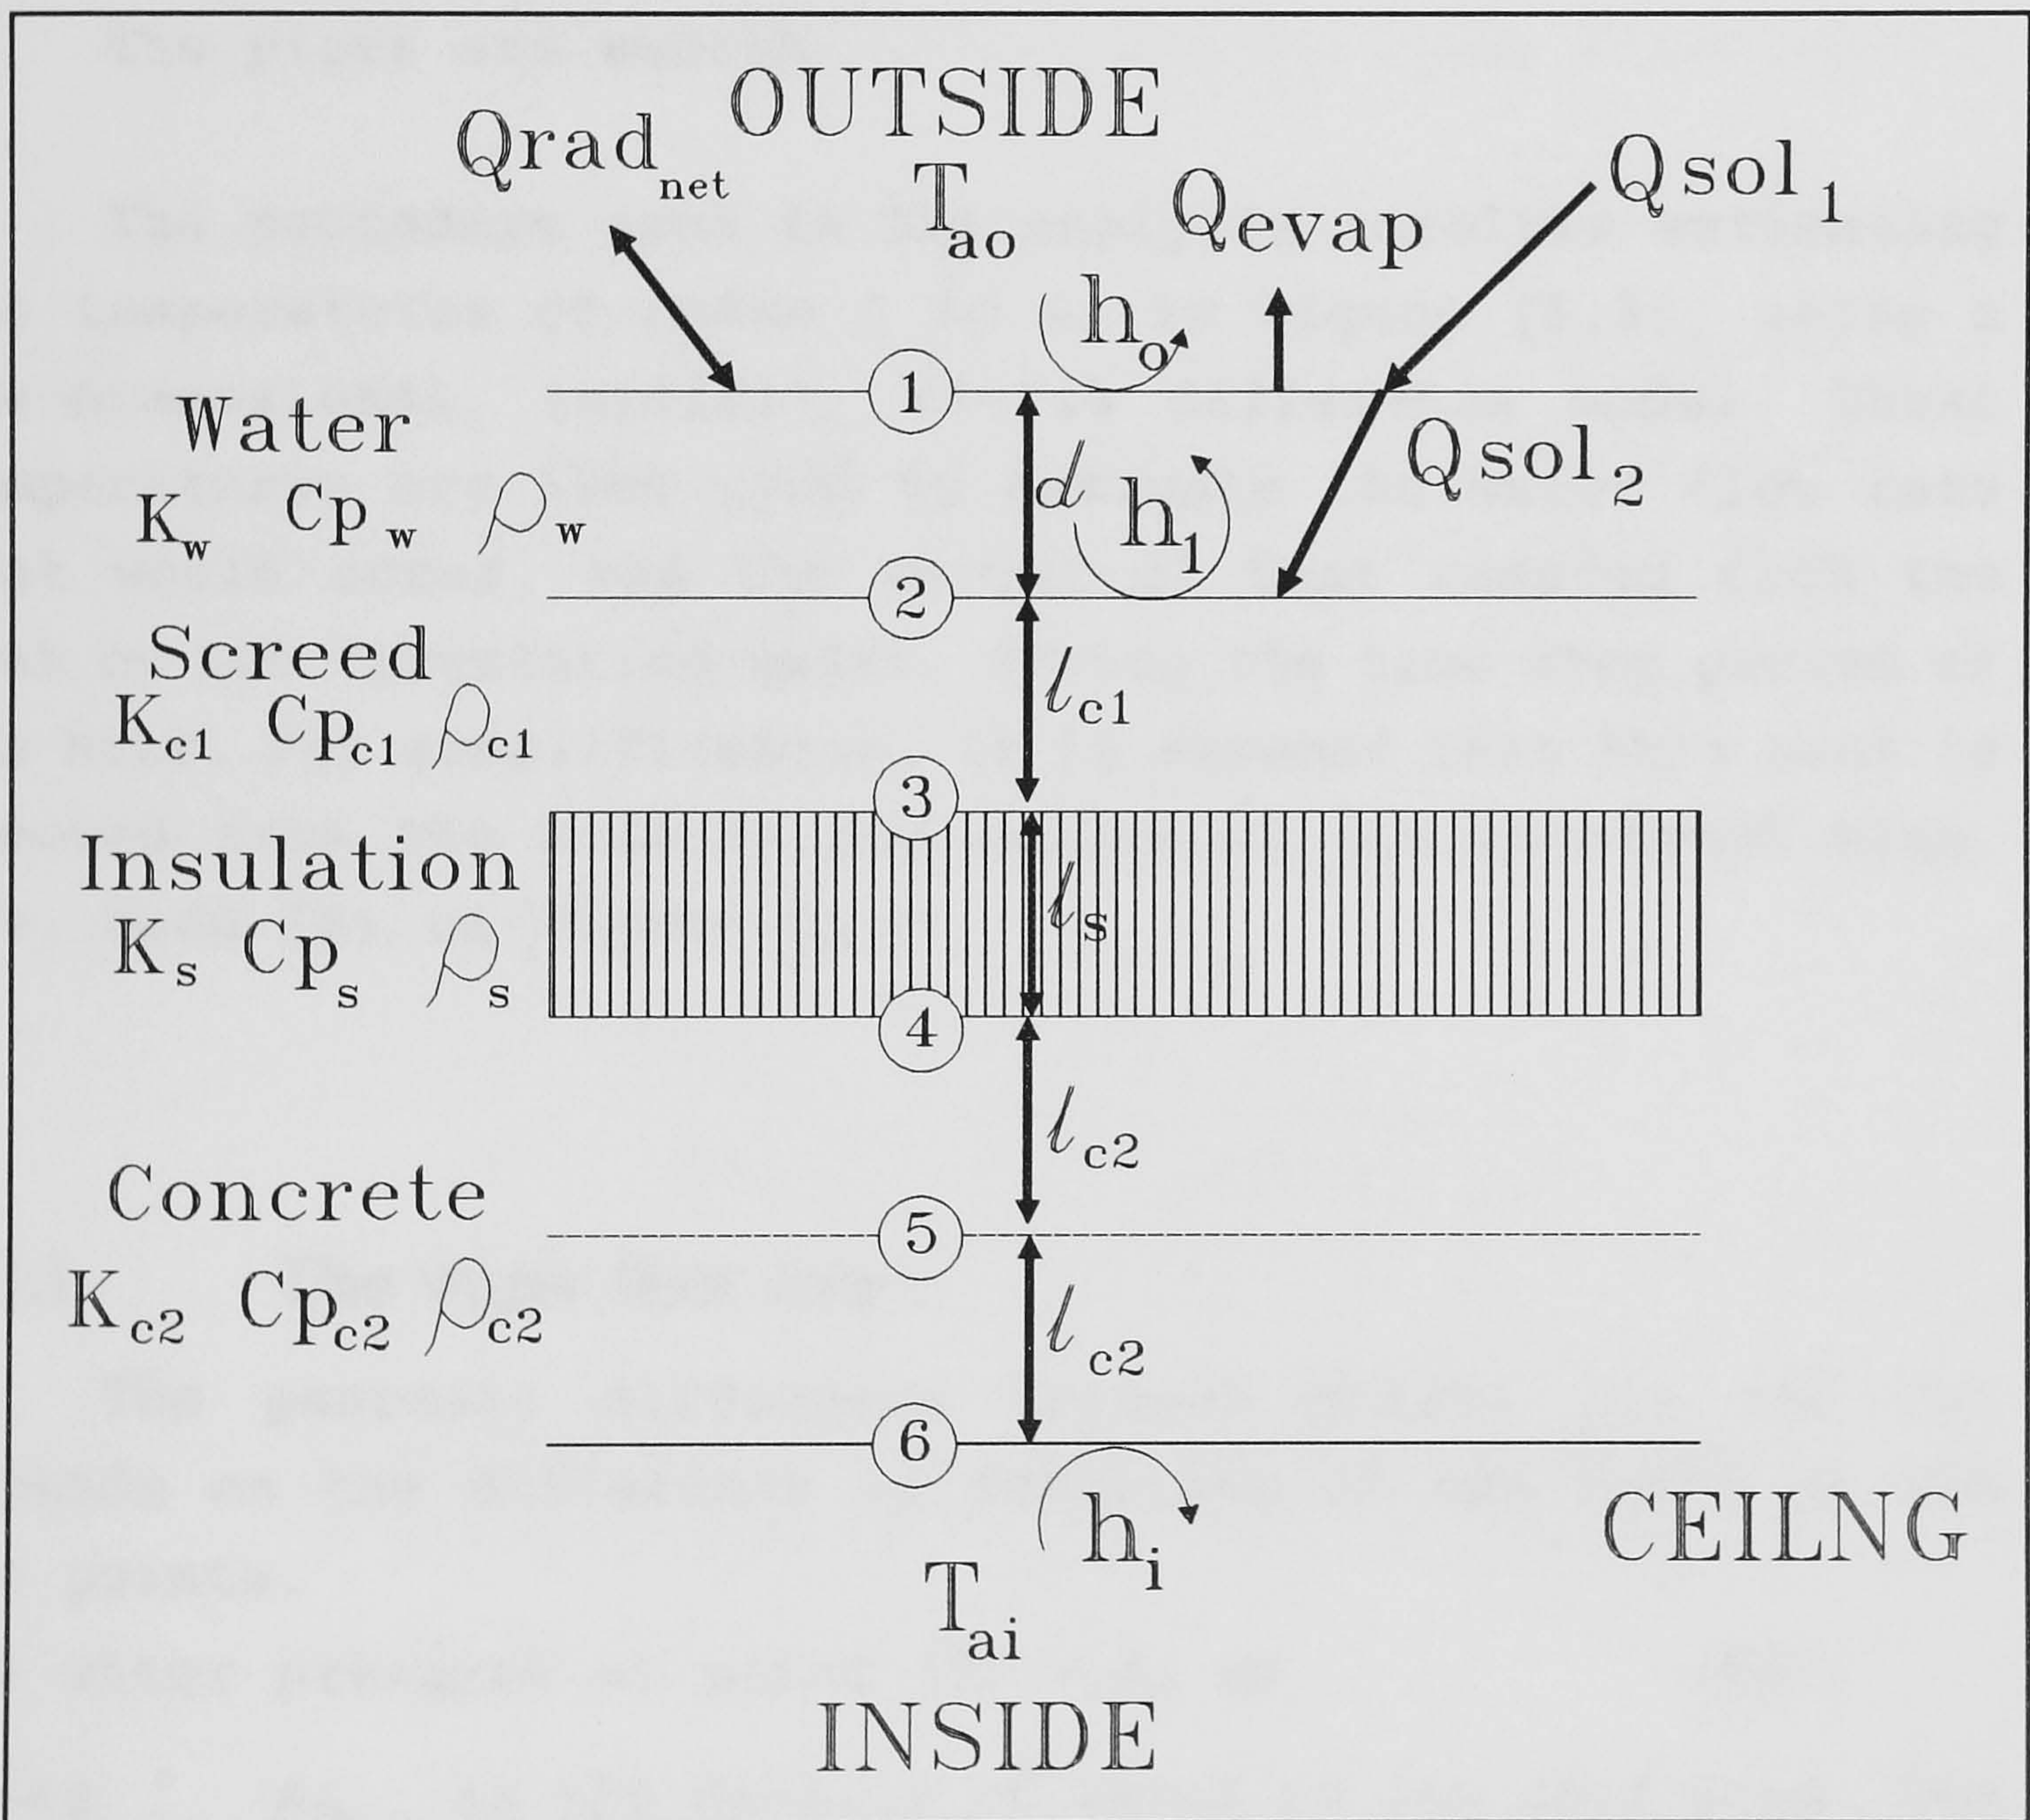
A cross-section of a roof pond with an insulated roof slab.
